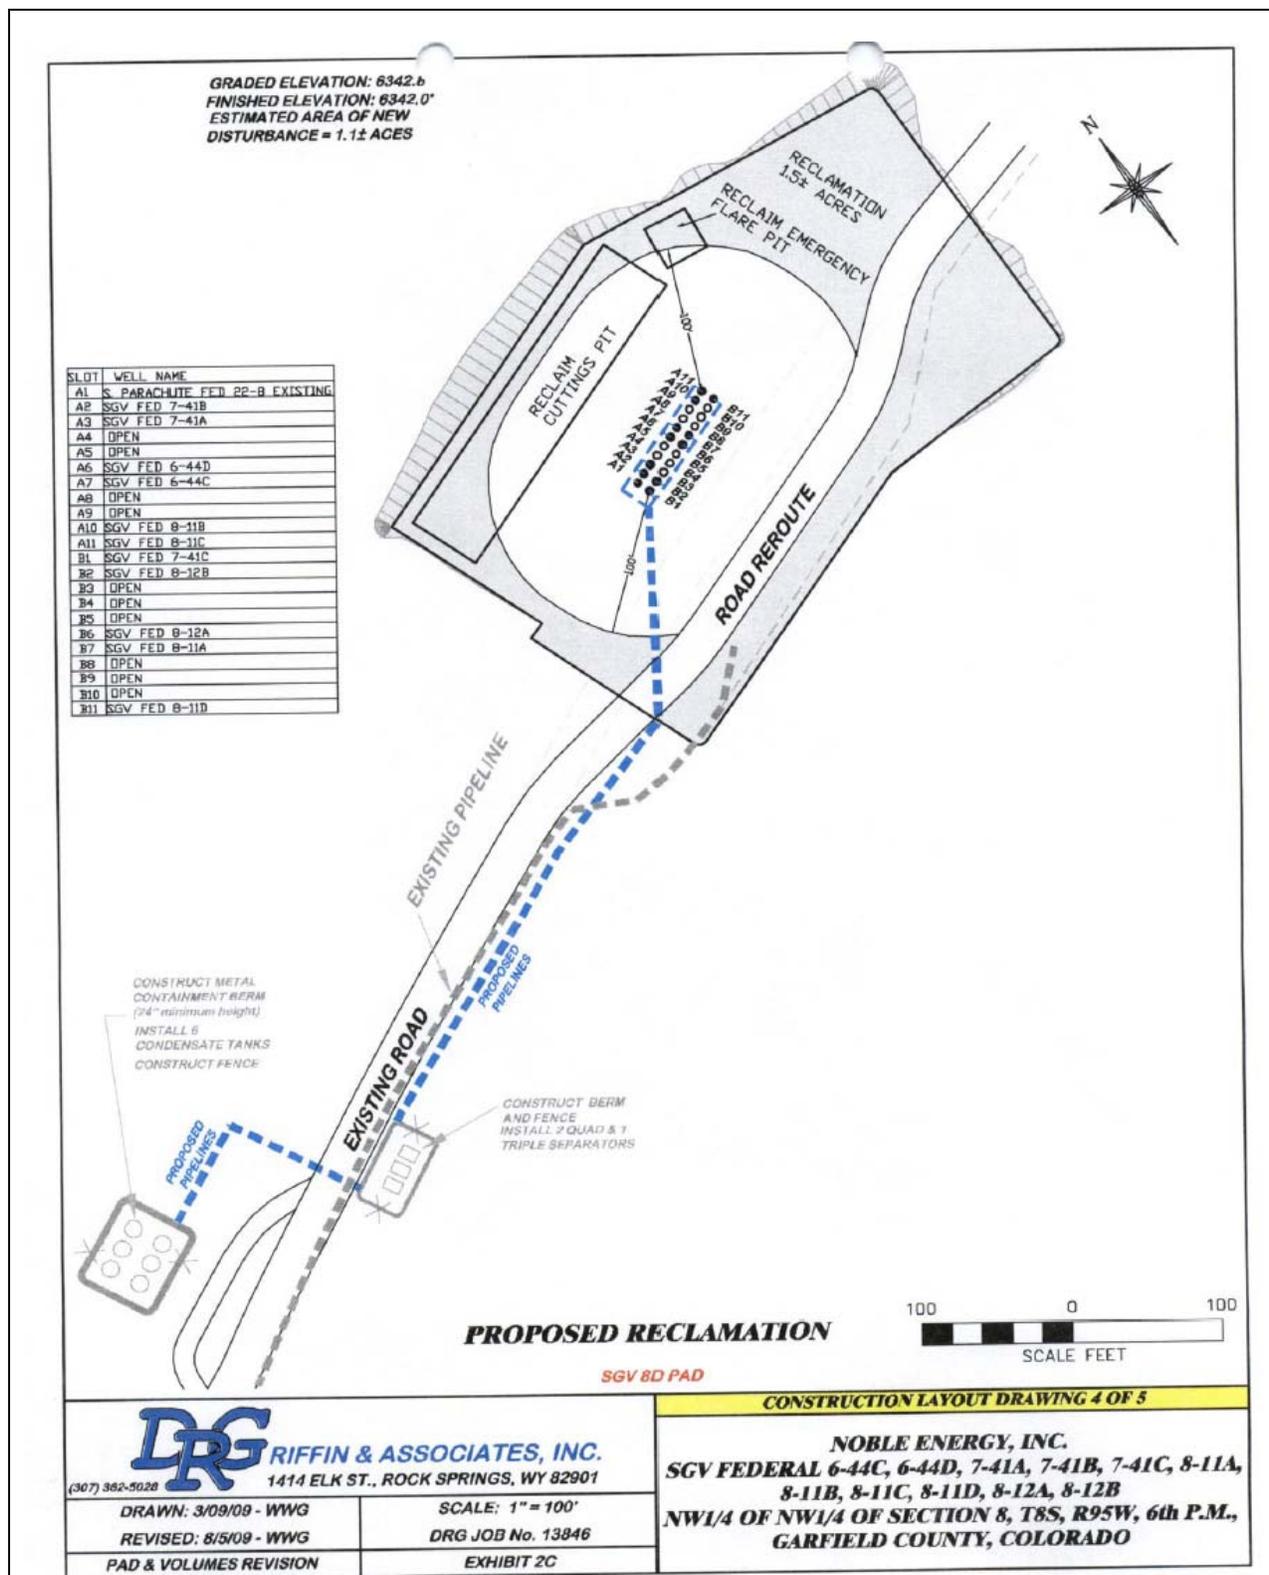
Proposed Pad and Facilities Layout in Interim Reclamation
